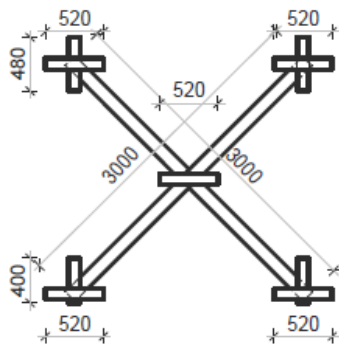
Dimensions and layout of the AFRP sheets – S5 [7]
